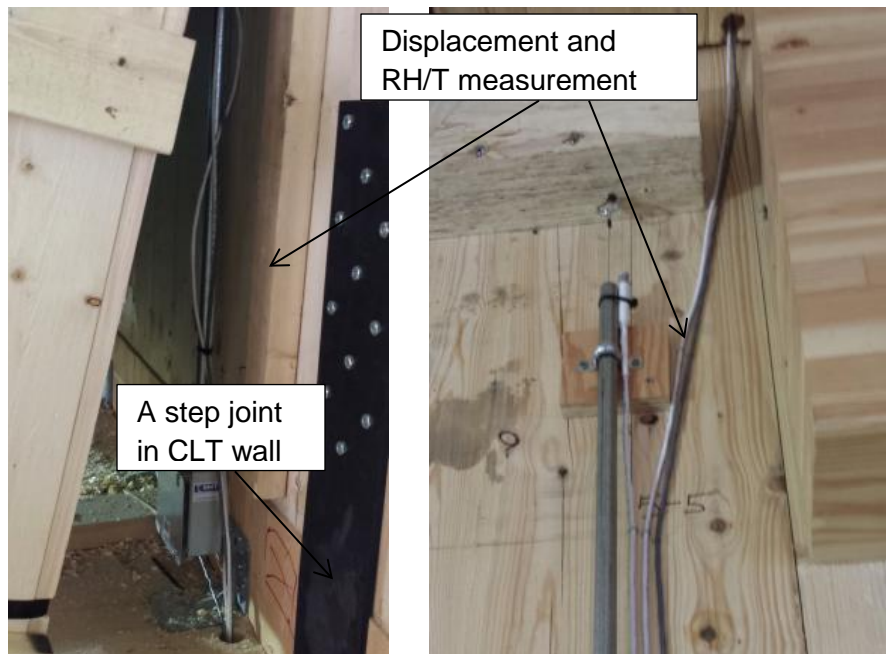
A displacement sensor covering a horizontal step lap joint in CLT wall (left photo) together with an RH/T sensor (right photo) on upper wall on Floor 5 at Location 5
